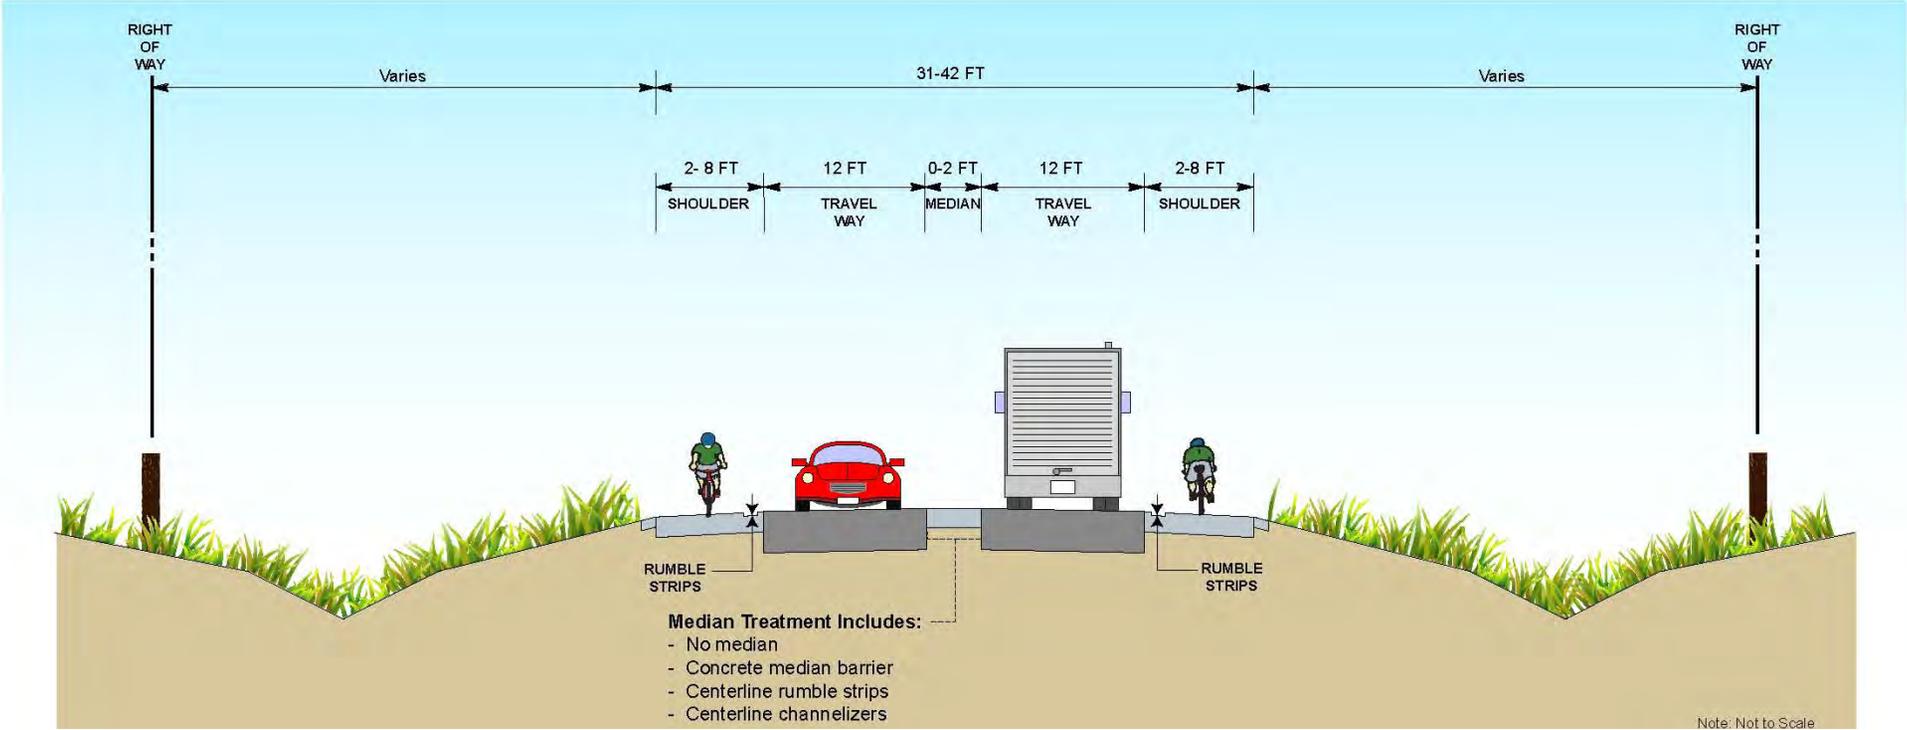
Typical Cross Section – Barrier Separated Two-Lane Strategy
